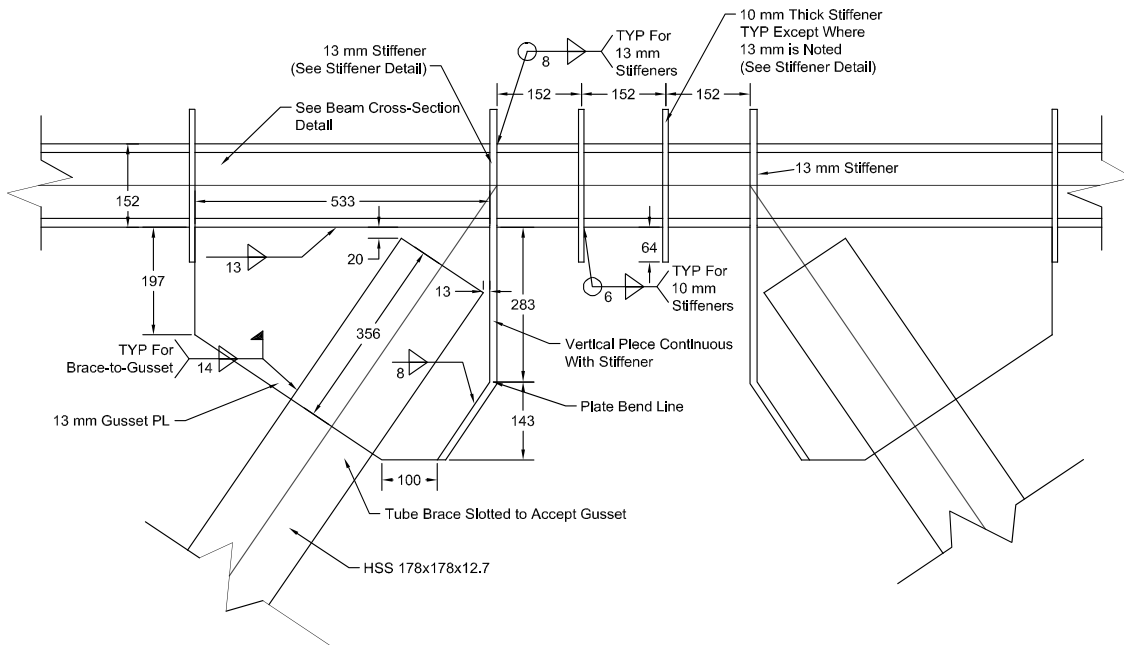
Link and Stiffener Detail (Berman and Bruneau 2005a)
